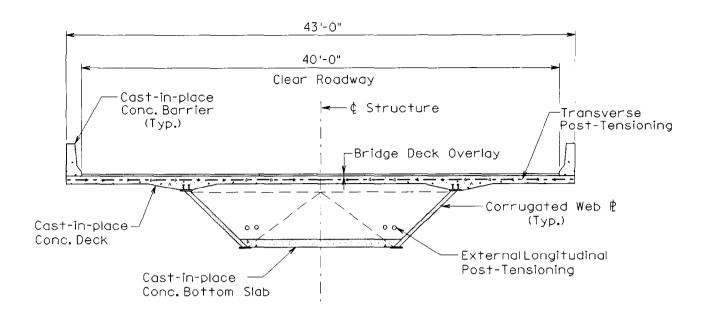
COMPOSITE CORRUGATED STEEL BOX
